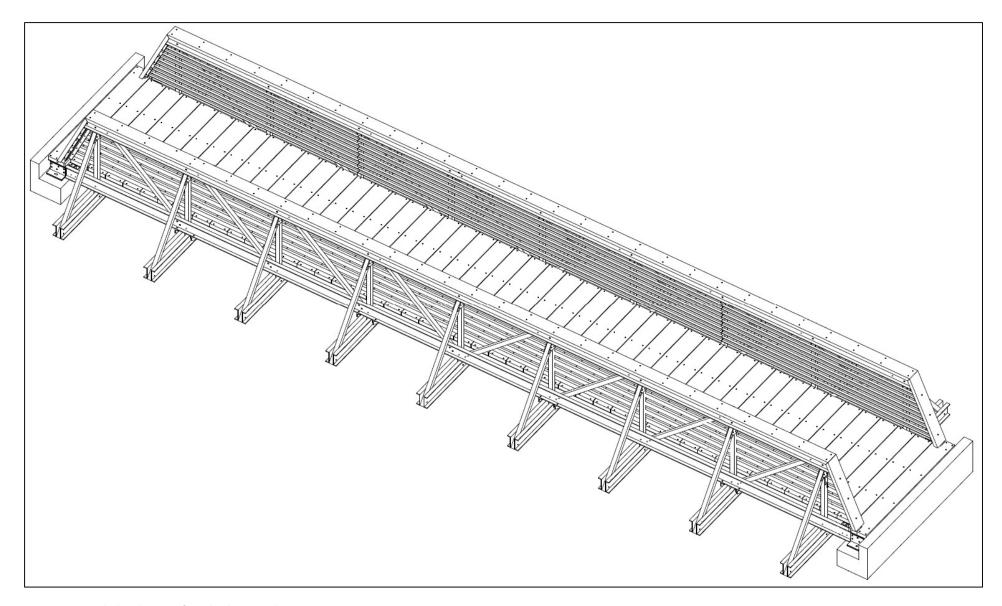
Typical Fiberglass Reinforced Polymer Bridge Drawing
